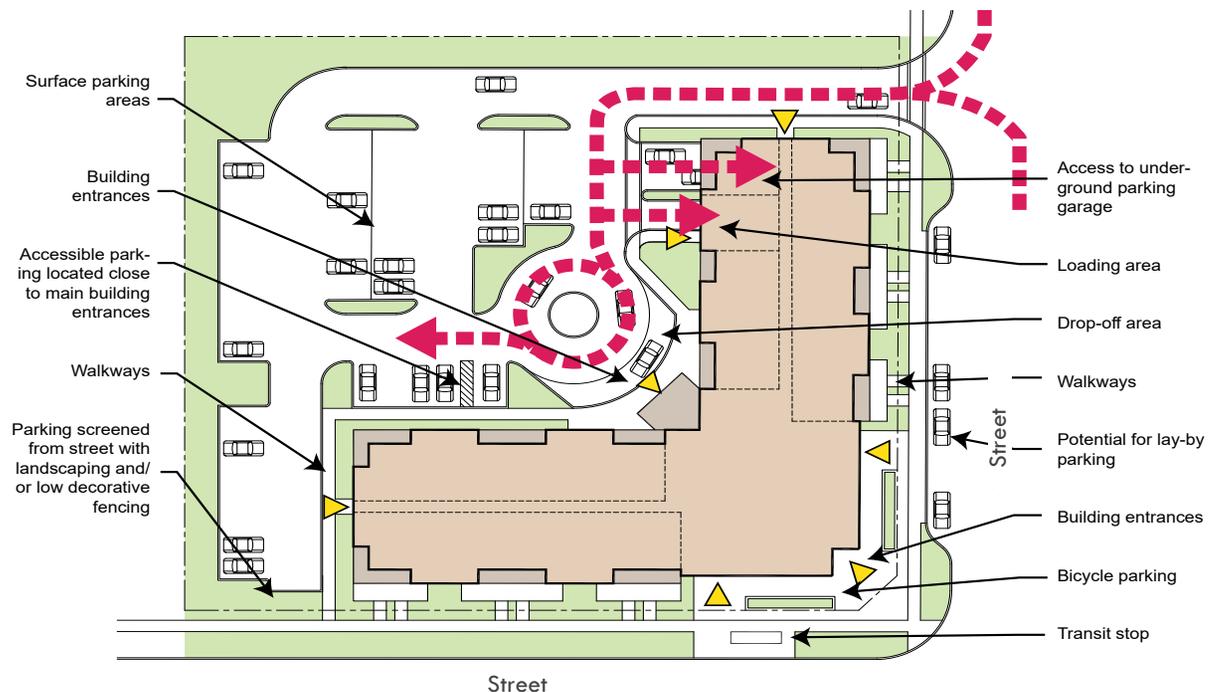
Conceptual Site Access and Circulation Plan
